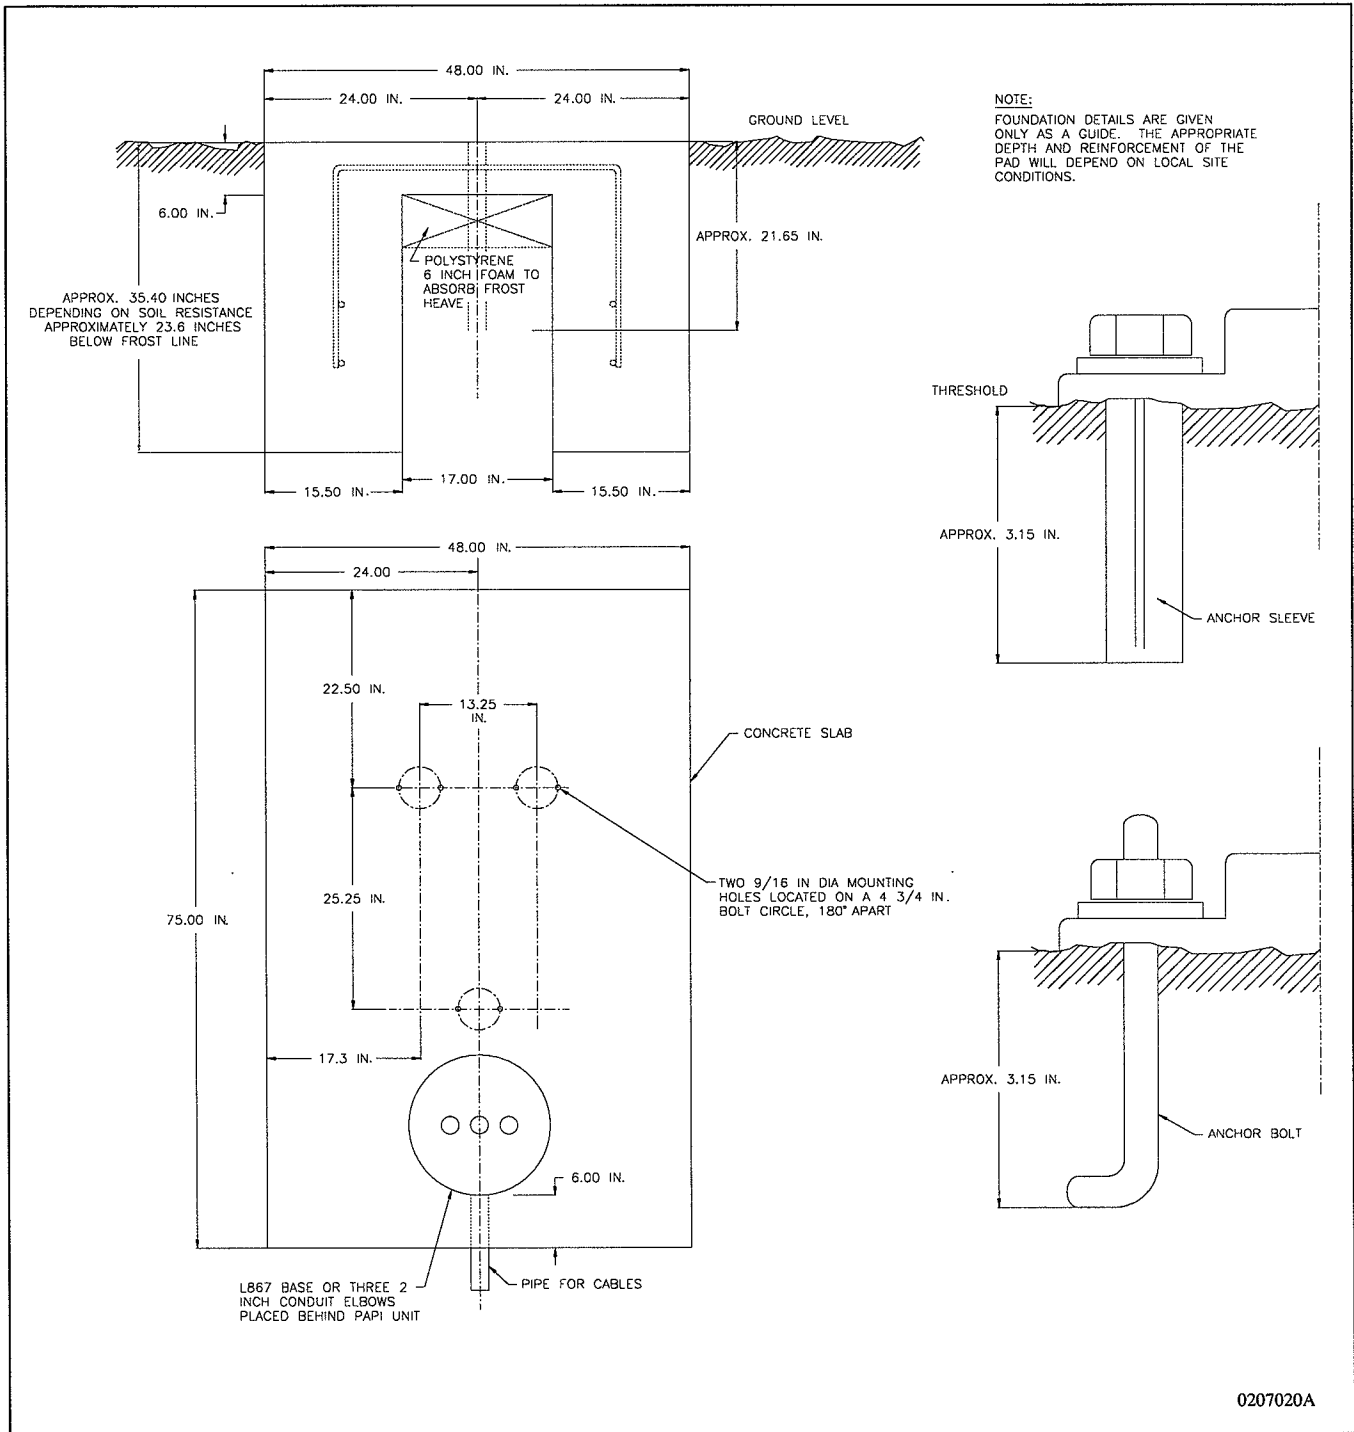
Installation on Concrete Pad (Two-Lamp, Three-Leg PAPI B) (Part 1 of 2)
